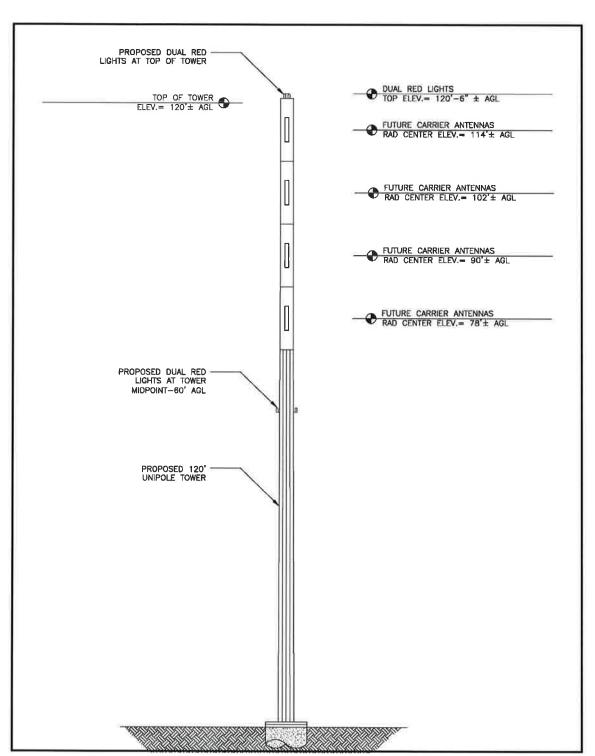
Elevation Sketch of Proposed Monopole Tower
